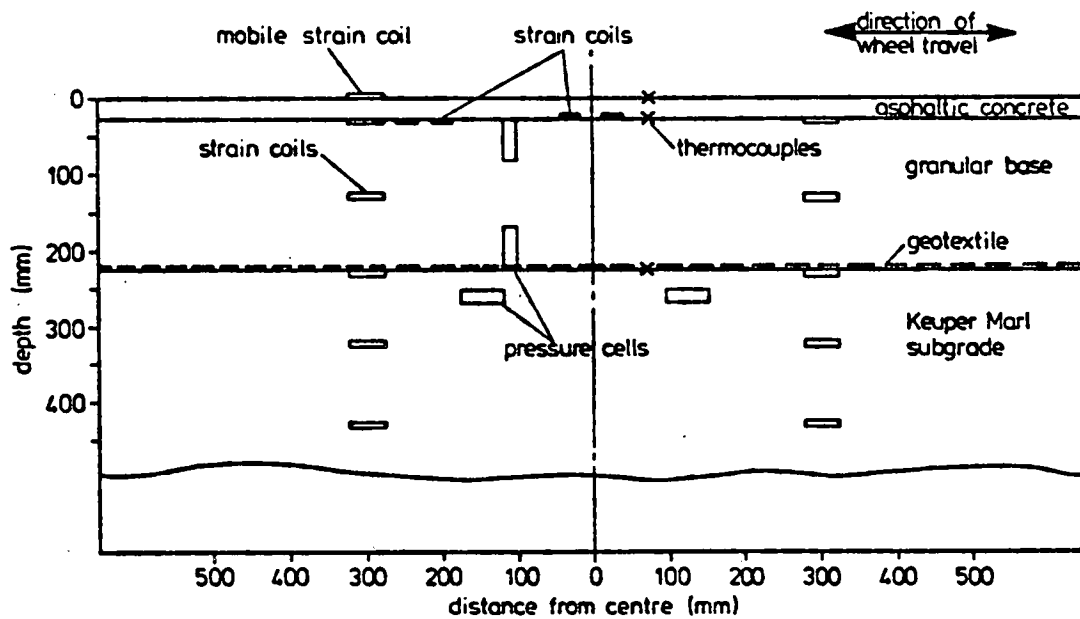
Typical Layout of Instrumentation Used in Test Track Study.
